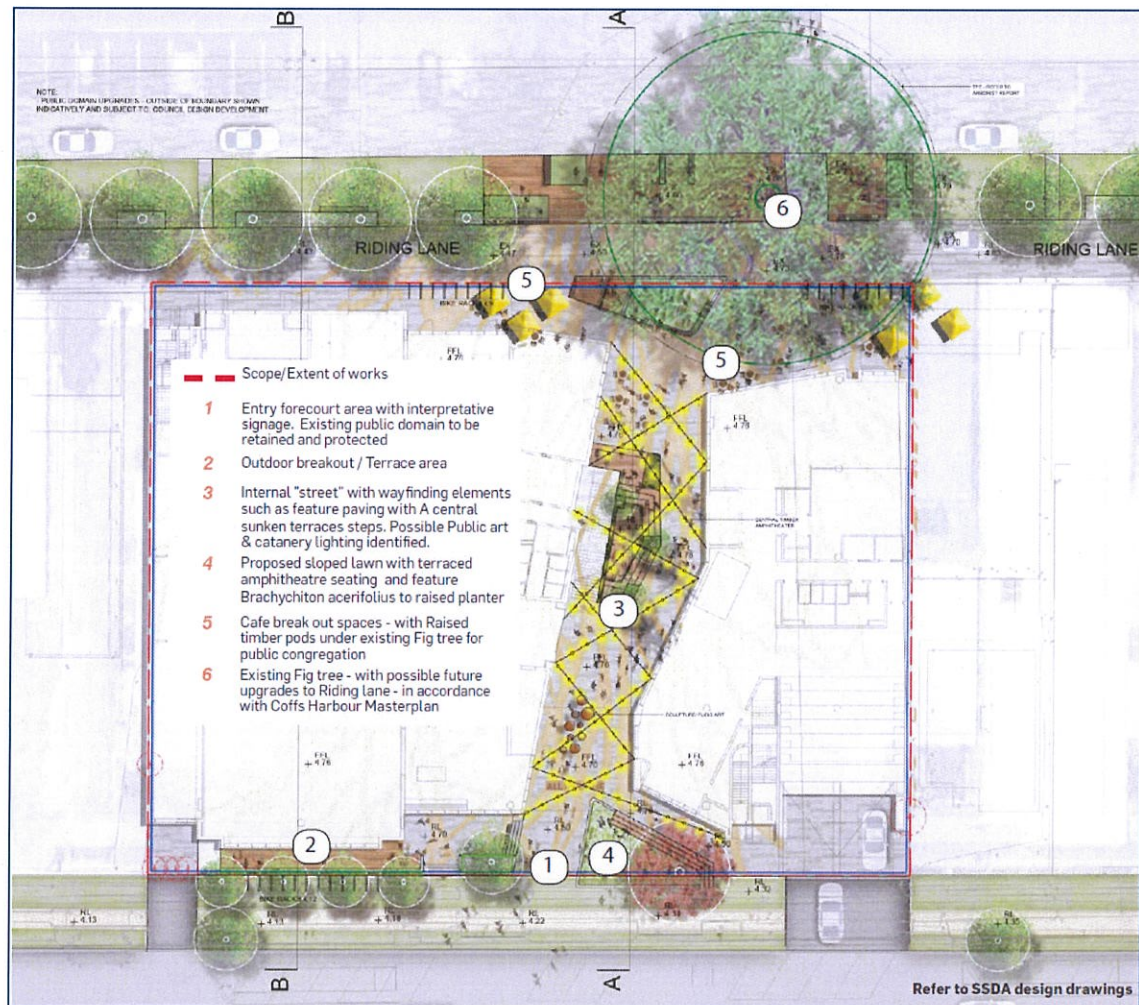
| Ground floor public domain elements (source: Applicant's Landscape Strategy)
